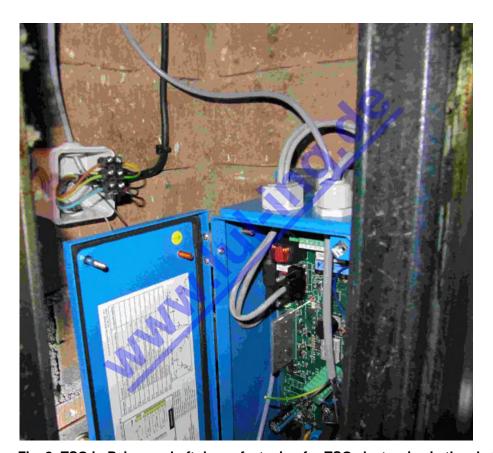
TSG in Peignen shaft door - fastening for TSG electronics in the shaft
